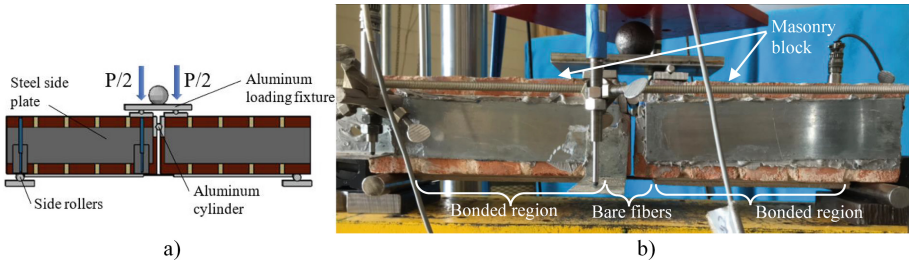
Hinged beam test: a) schematic, b) photo of test setup.
